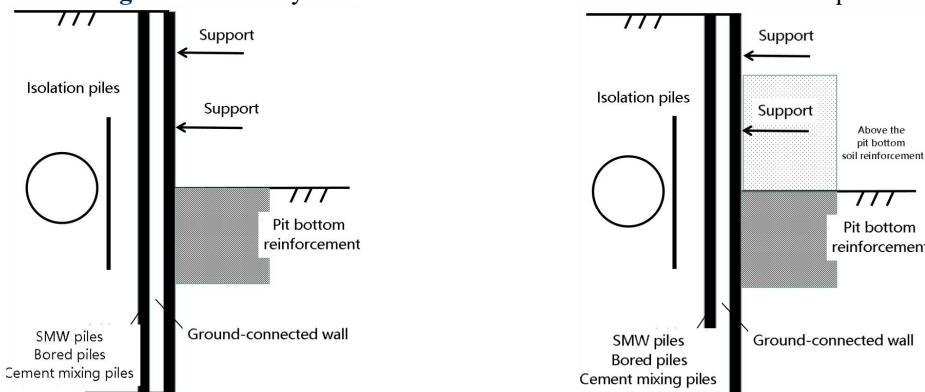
Plane Layout of Soil Reinforcement in the Passive Area of q
